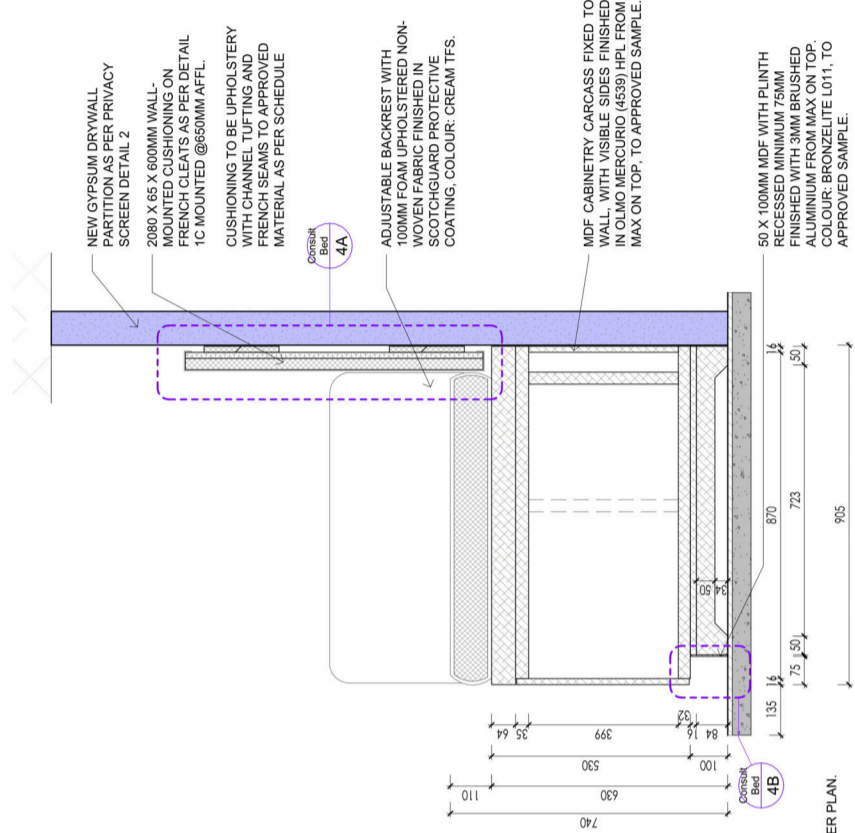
| 1:10 ELEVATION OF CONSULTATION BED AND WALL-MOUNTED BACKREST
